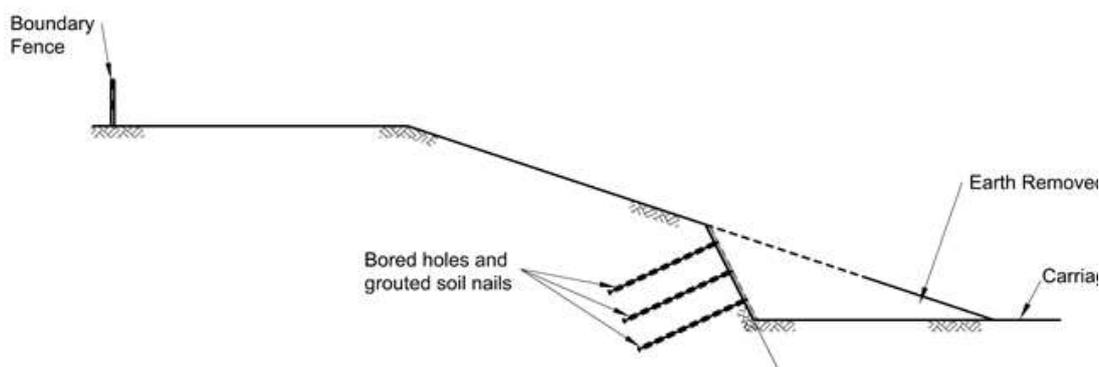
Widening of a cutting using a steepened toe stabilised with soil nailing and a facing (diagrammatic only)
